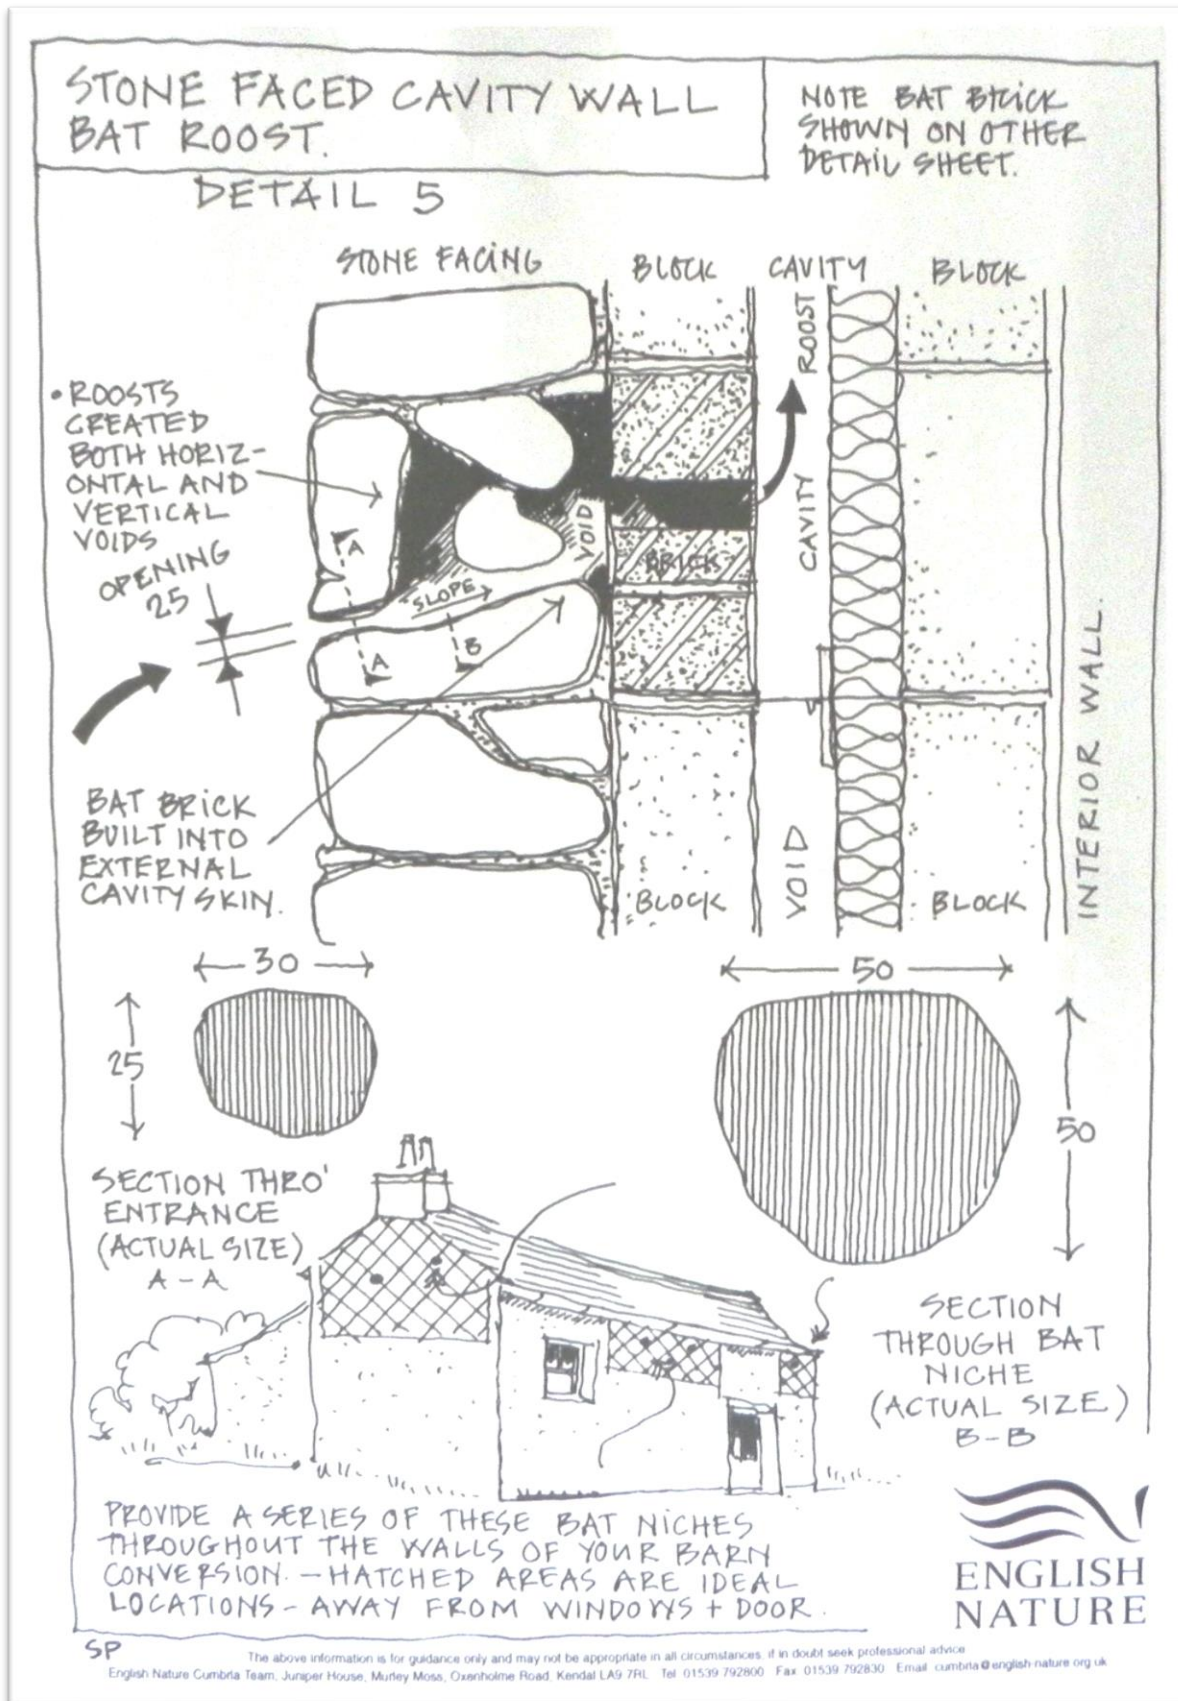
Figure D: Stone Faced Cavity Wall Bat Roost (Source: English Nature).
